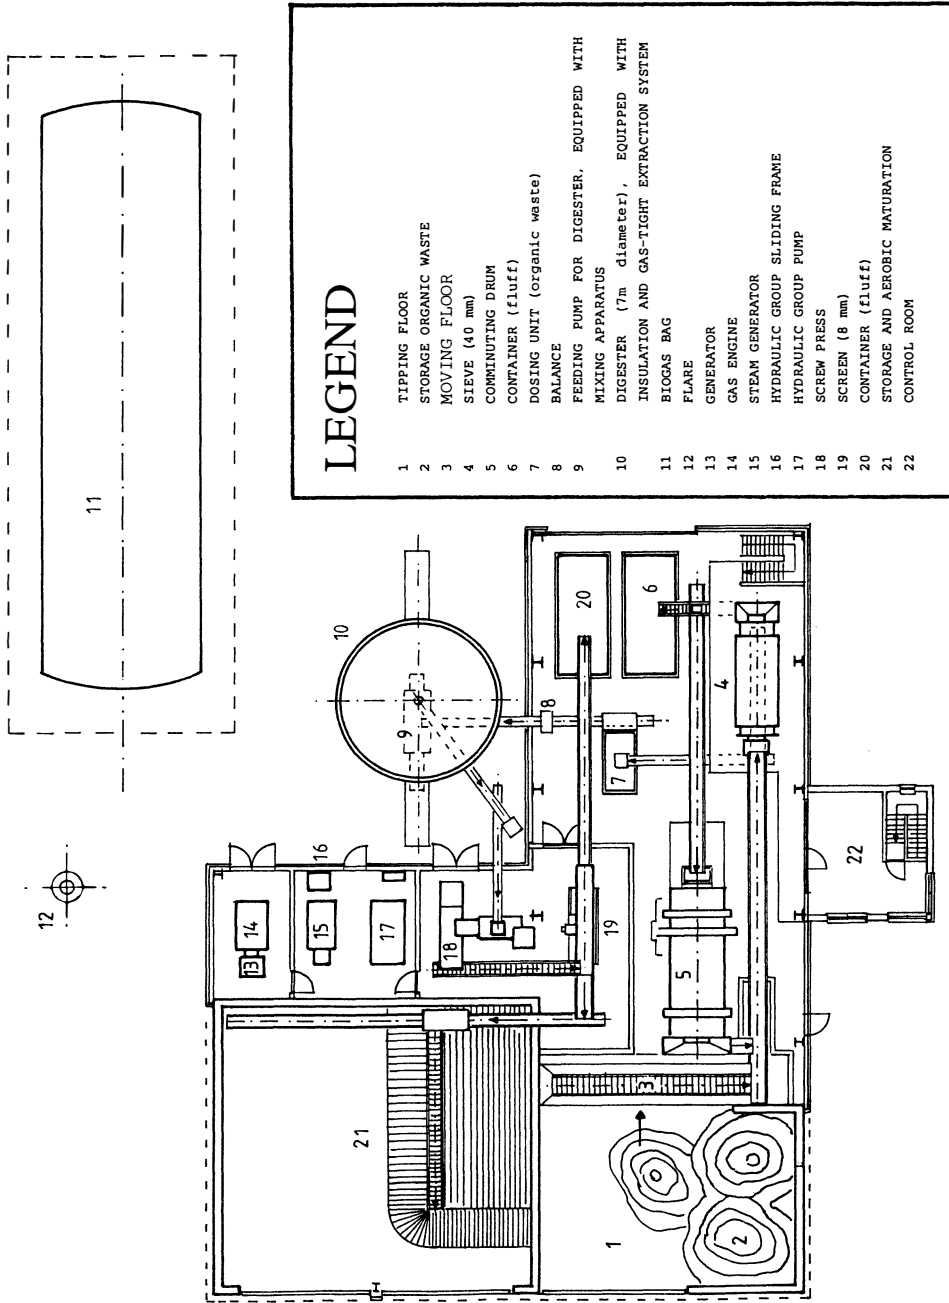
Lay out of DRANCO installation Brecht, Belgium
